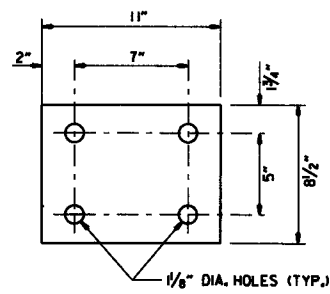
### DETAILS OF WOOD LINE POST CONNECTIONS (W-BEAM)
